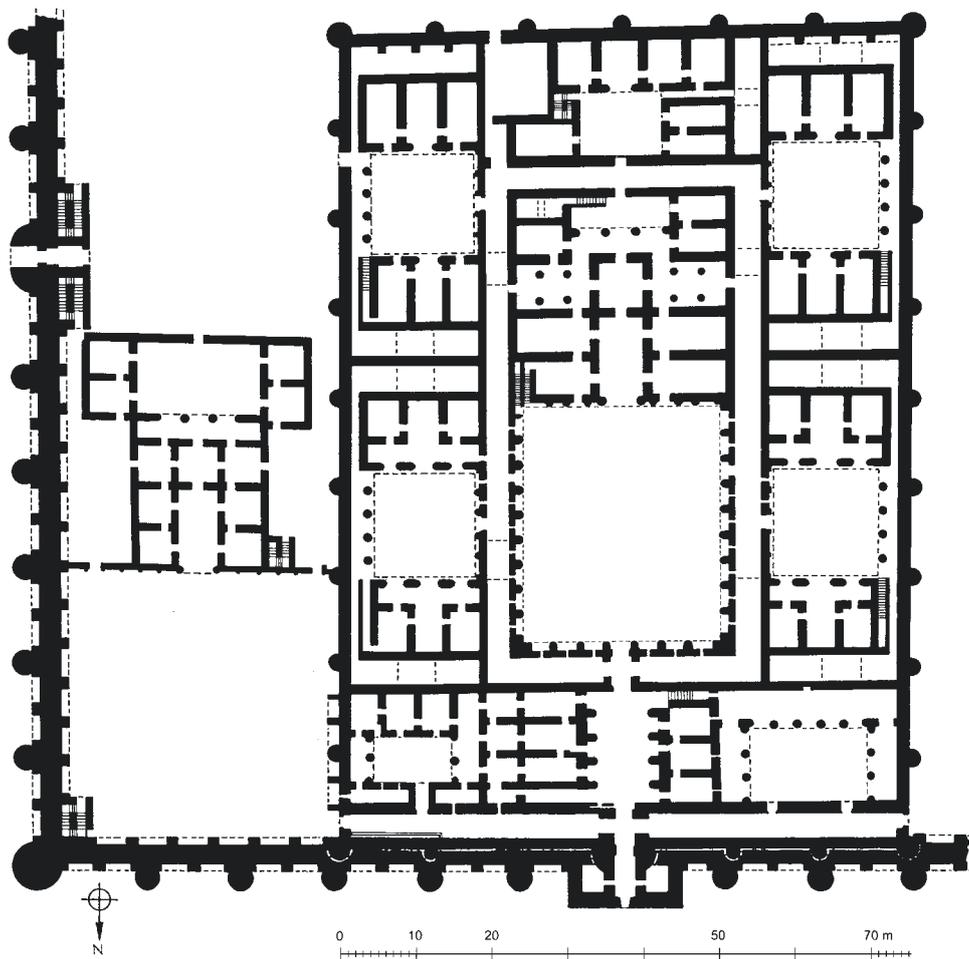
al-Ukhaydīr, residence, main building and inner annexe within the enclosure, ground plan. – (After Creswell/Allan, Short fig. 147. Labels removed, new scale added).
